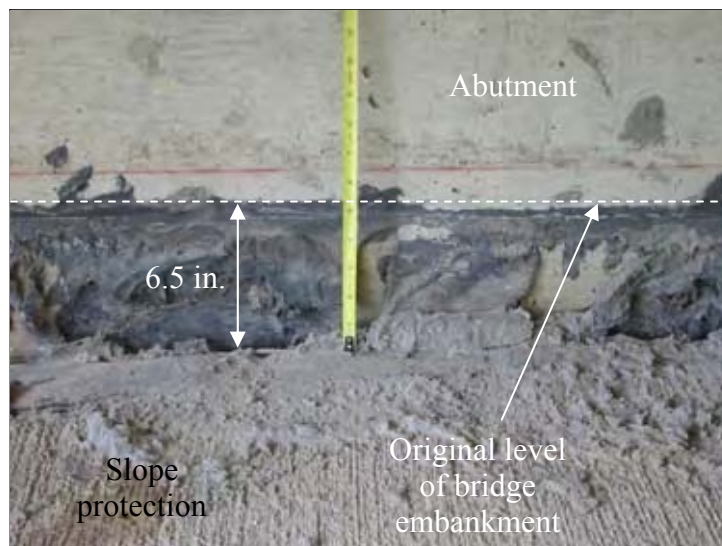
Settlement of the embankment slope protection of 6.5 inches
